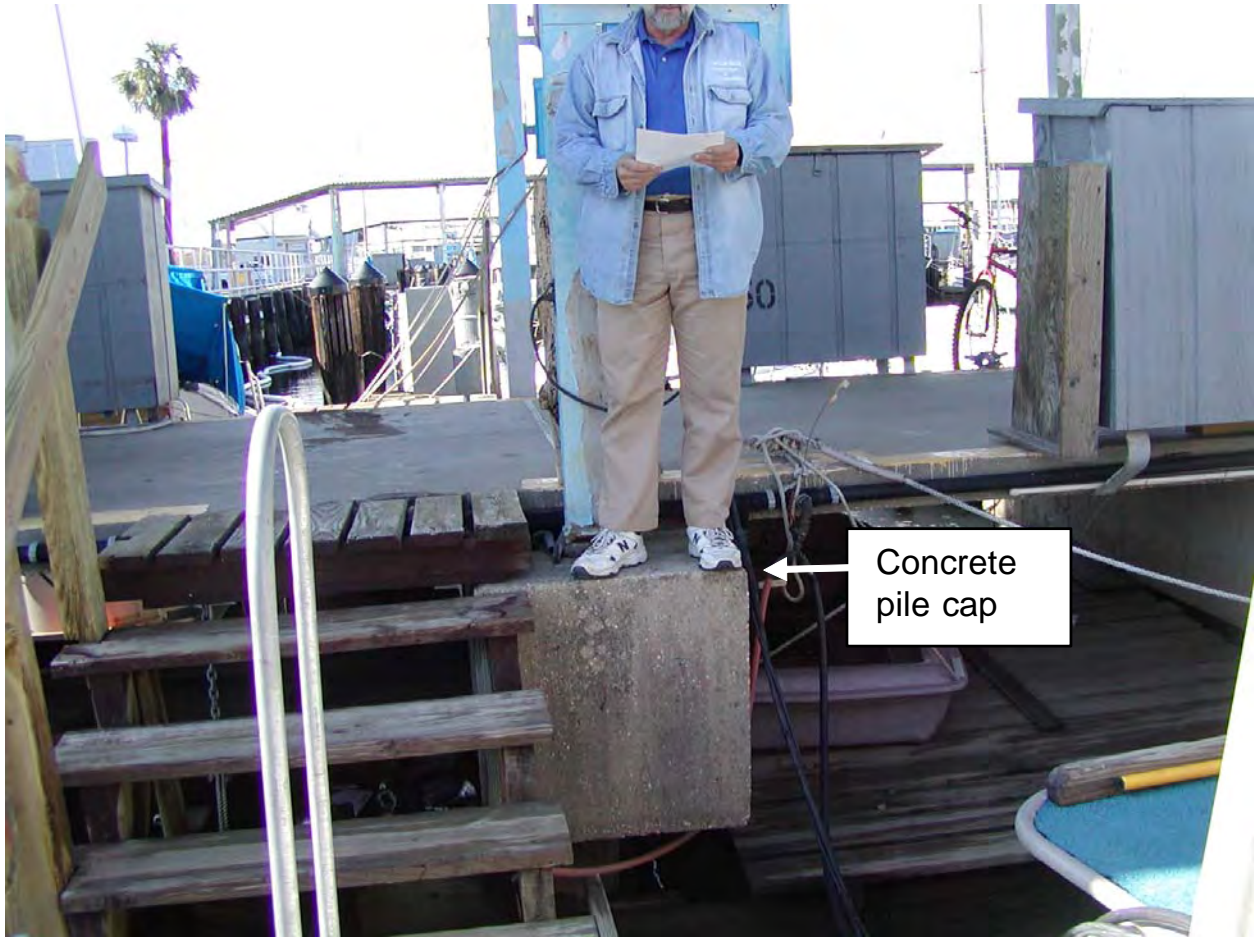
Time 4:00 on 8/29/05, elevation 5.1 ft. Top of concrete pile cap next to steps
